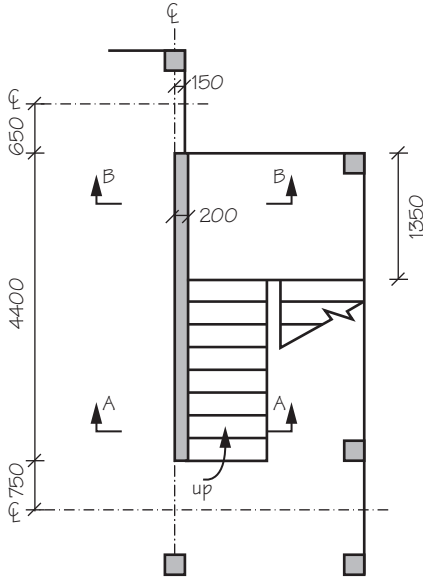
Plan of wall A and location of sections A-A and B-B
